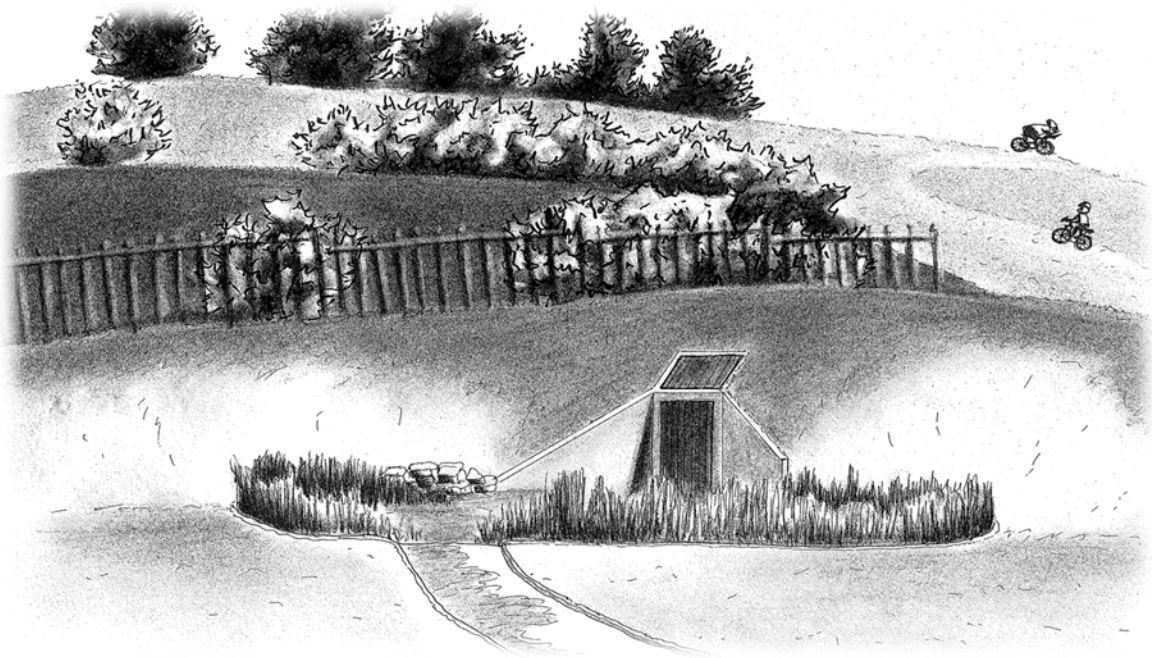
Flared wall outlet structure configuration. Graphic by Adia Davis.
